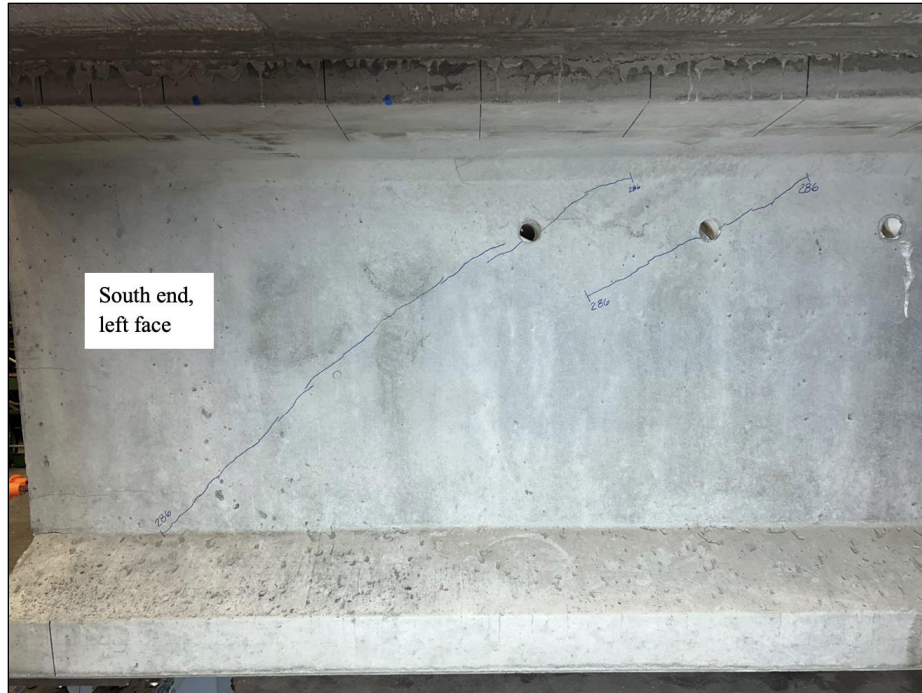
Photo. Test 4.2.S (repair 4.2RBZ, 4.2RTFE, 4.2RTF, 4.2LTF) initial shear cracks on nonrepaired bottom flange face at 286 kip (left face of girder pictured).
